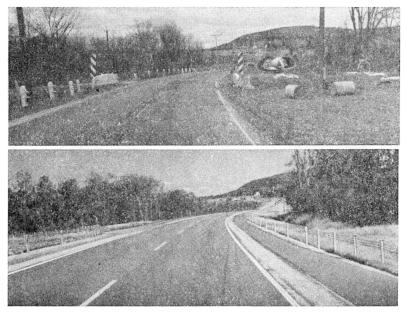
Pavement and Safety Improvements including Elimination of Hazardous Bridge
